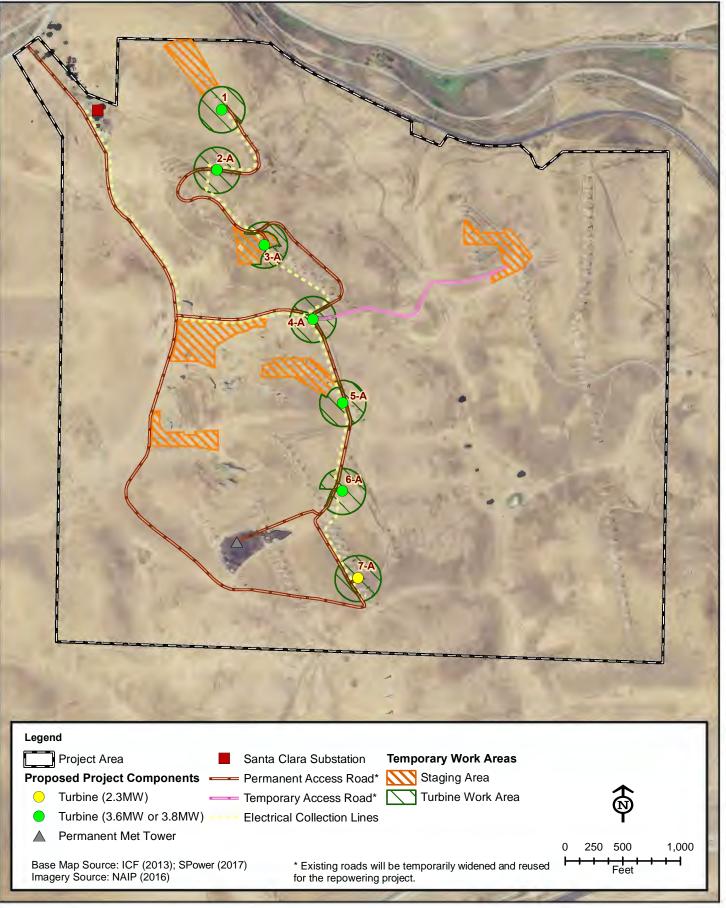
Rooney Ranch Wind Repowering Project—Layout 2
